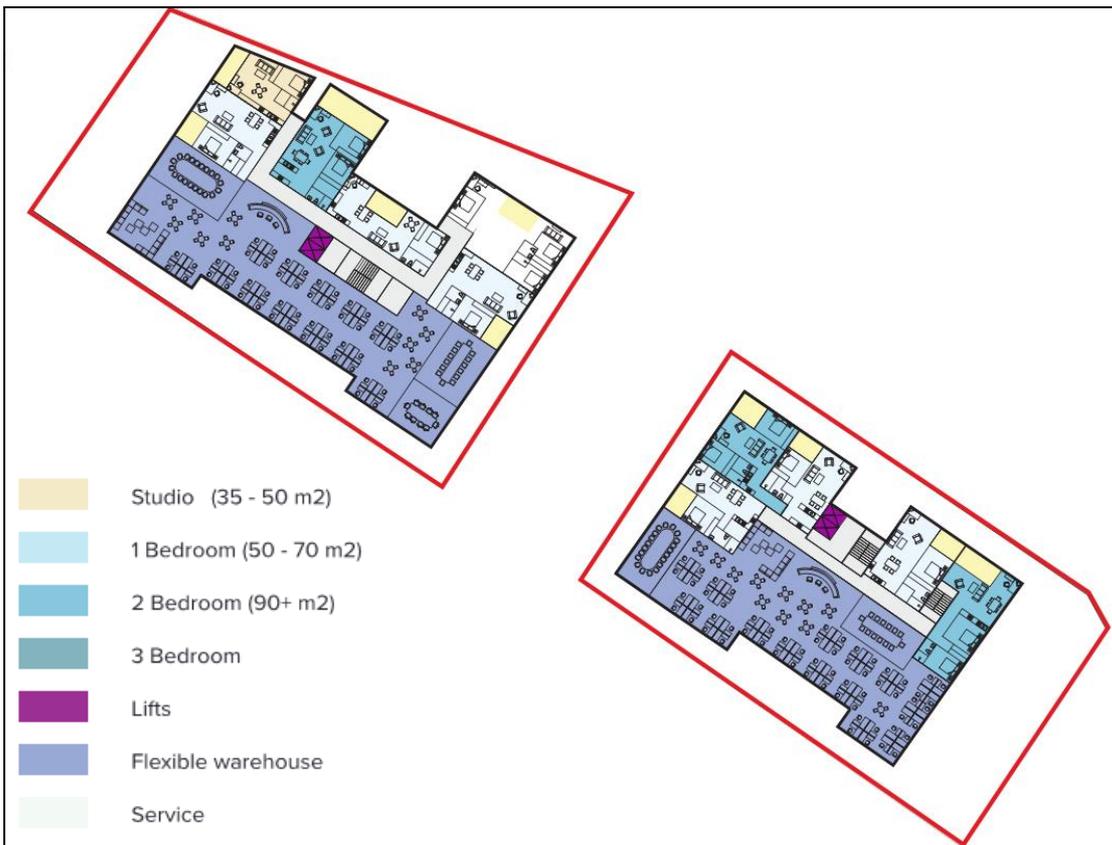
Concept Site Plan (Roberts Day 2019)
